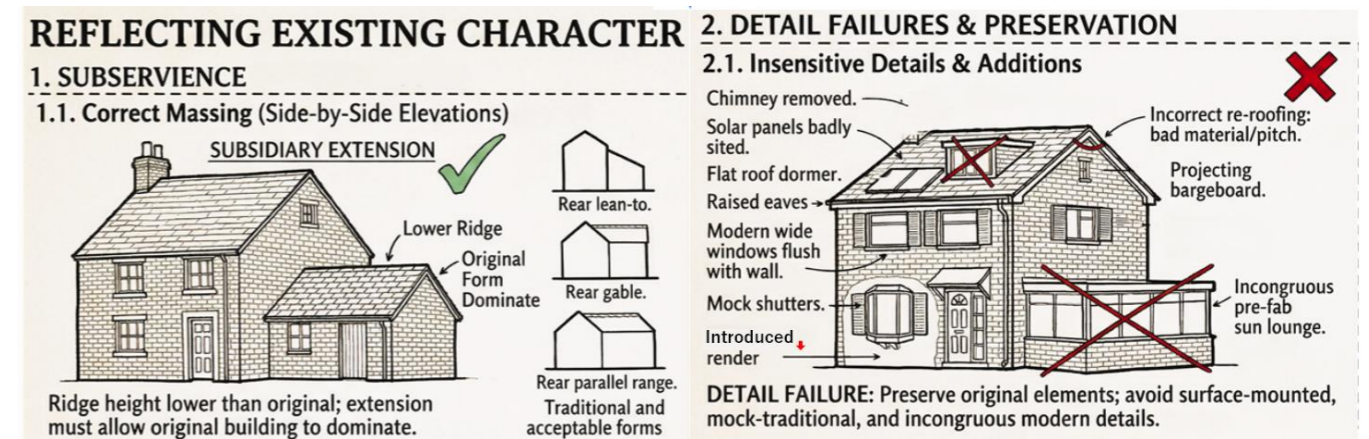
Assuring appropriately detailed buildings that retain positive characteristics is key to good building design
